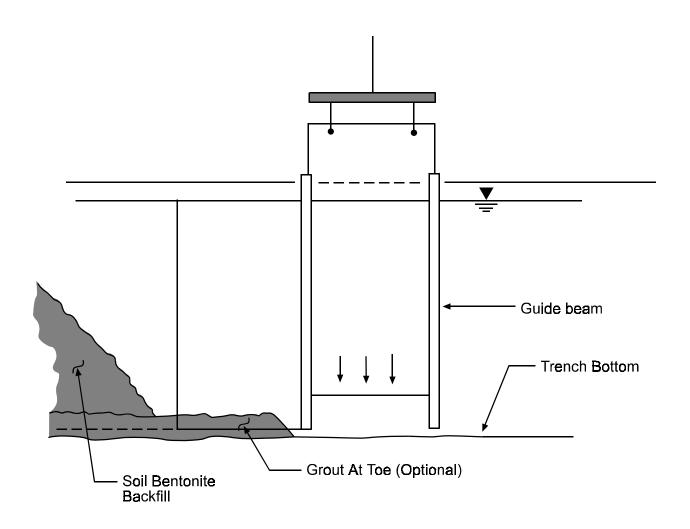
Installation Method for a Geosynthetic Composite Wall
